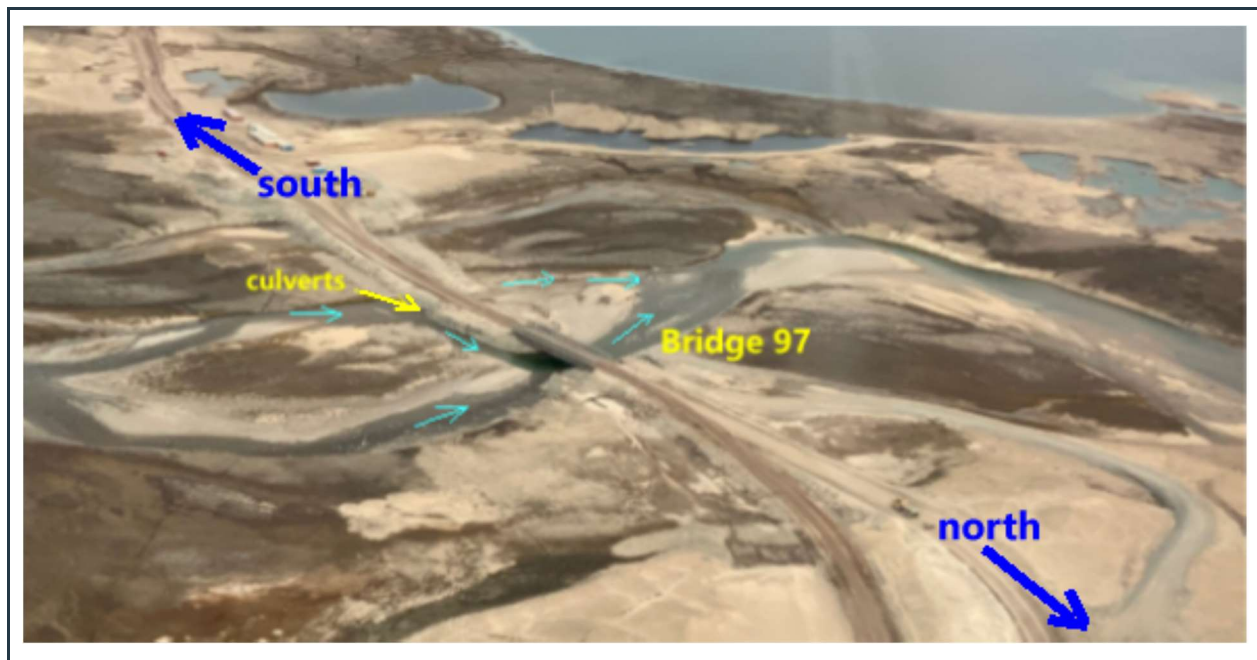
View of a section of the Tote Road between the Mary River Mine site and Milne Inlet Port (looking south). Bridge 97 is seen in the center, with two (2) culverts just south of the bridge.
